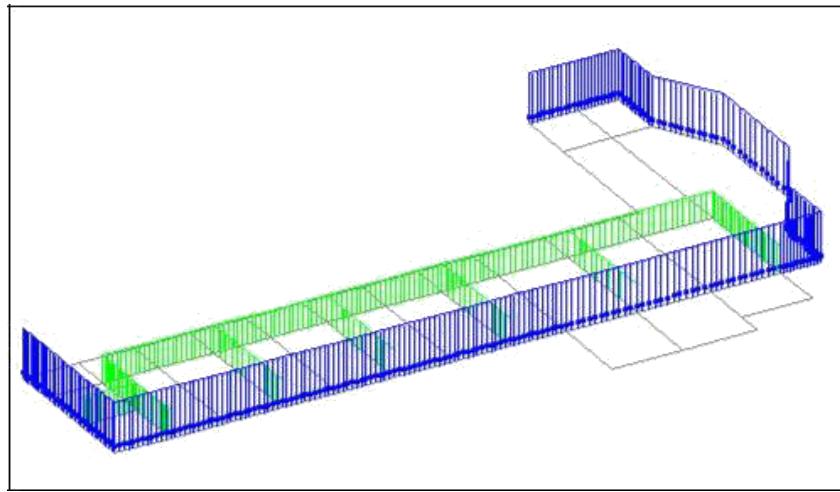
Load distribution on 1st of intensity 18.4 N/mm floor of the structure
